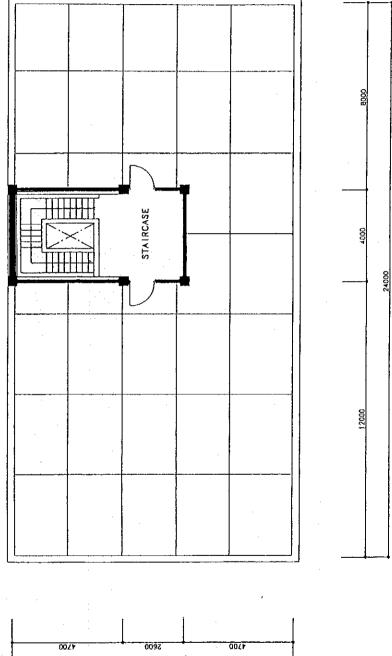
(3) ROOF FLOOR PLAN (4-CLASROOM TYPE)
